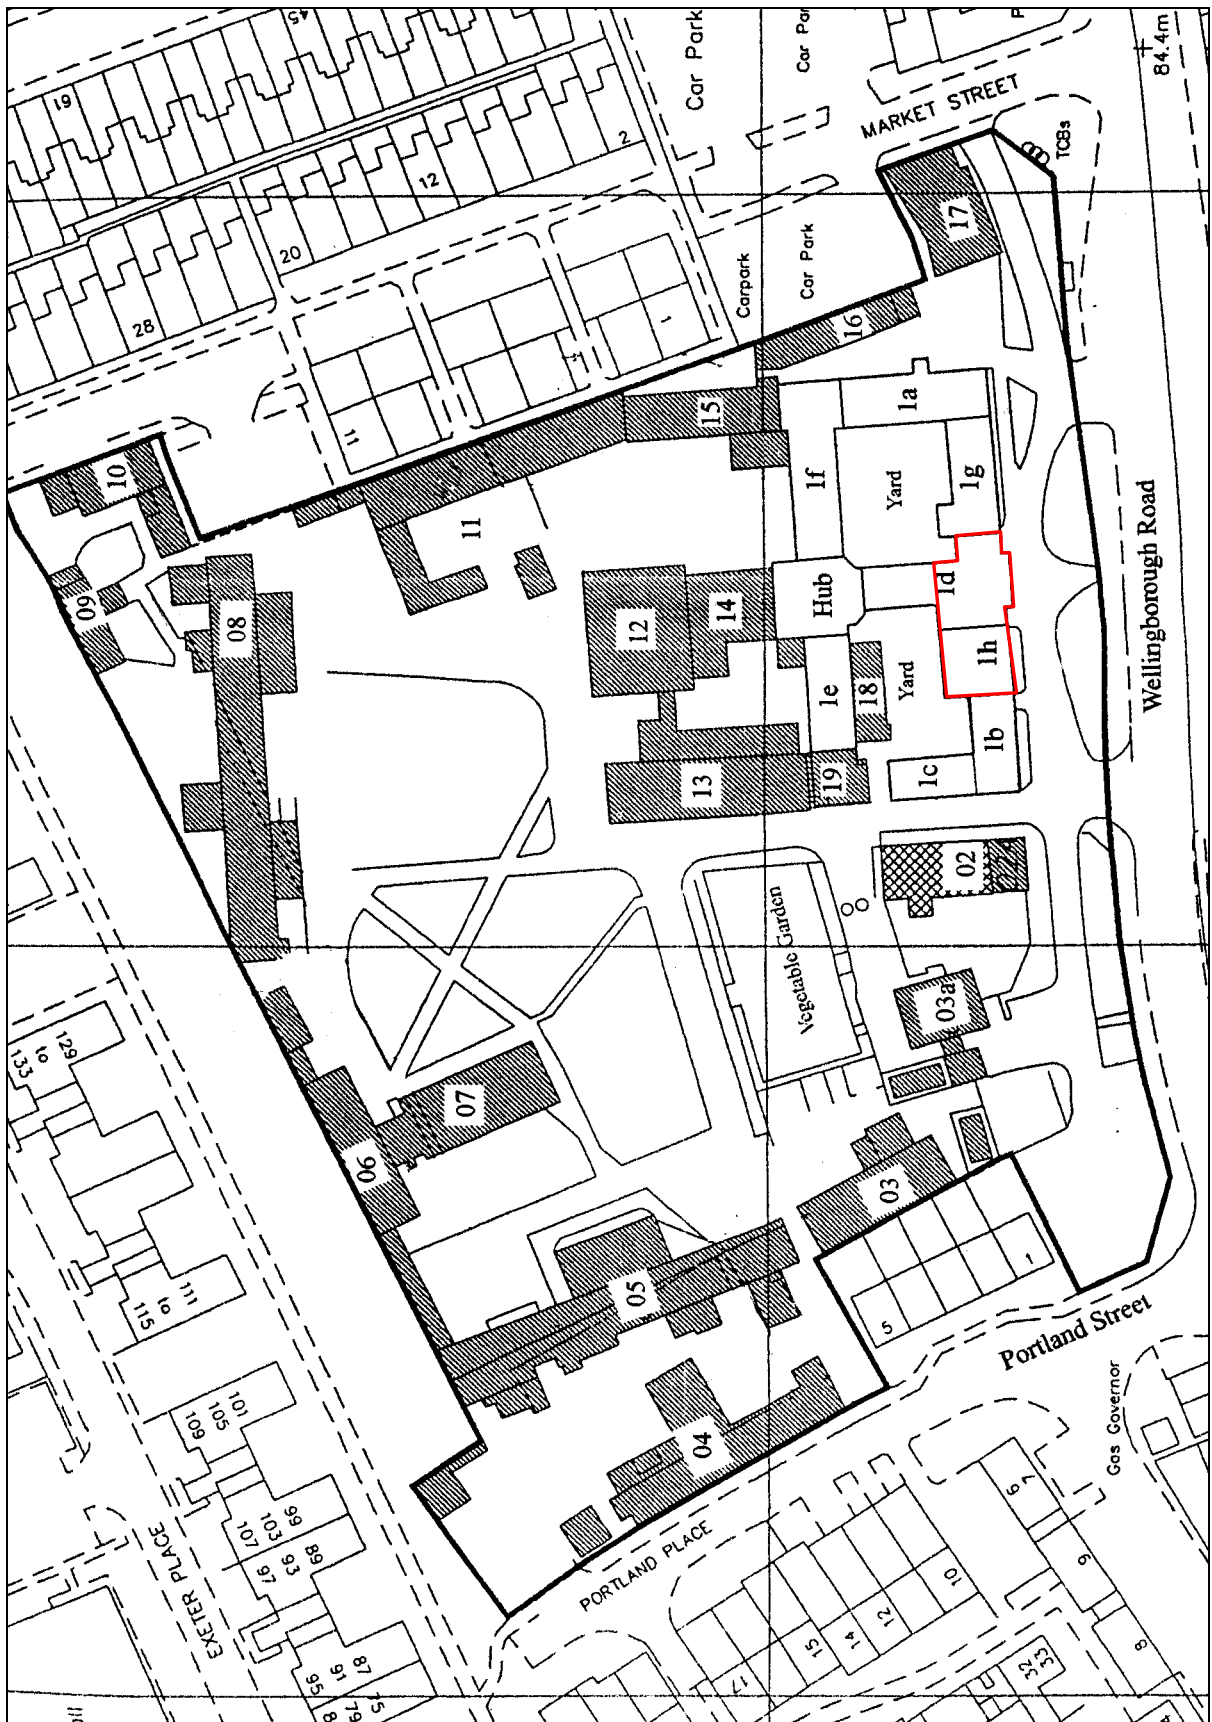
Site plan (scale 1:1,000). Listed structure in red.
